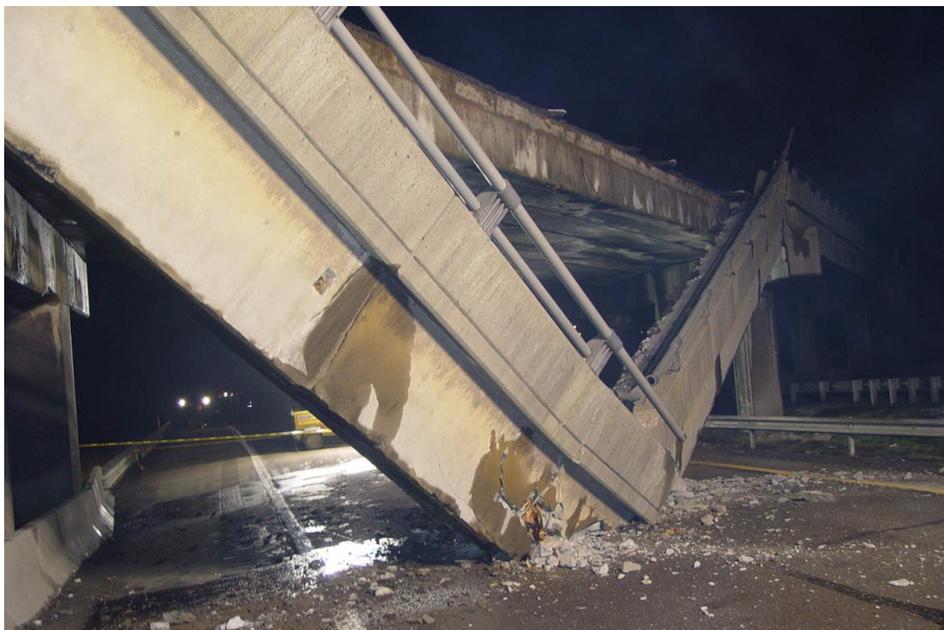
Failure of adjacent box beam bridge in Pennsylvania. (Courtesy Pennsylvania DOT)
